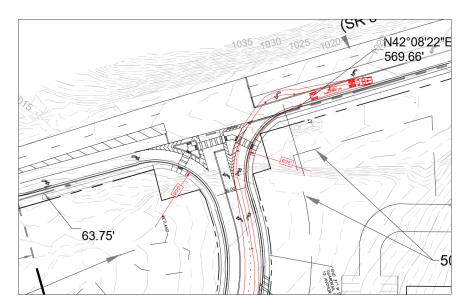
Winder Highway (SR 8/US 29) at Stanley Road – Northbound Right (Exiting Truck)
